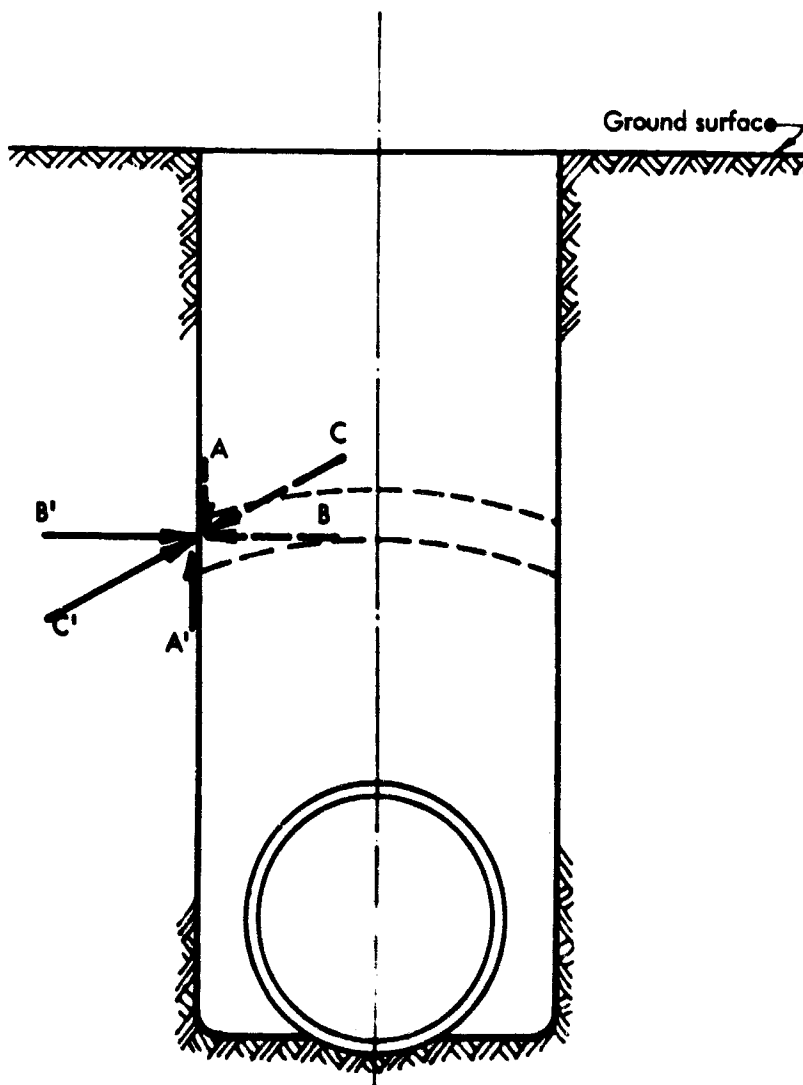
Arch Action in Backfill Over a Ditch Conduit
